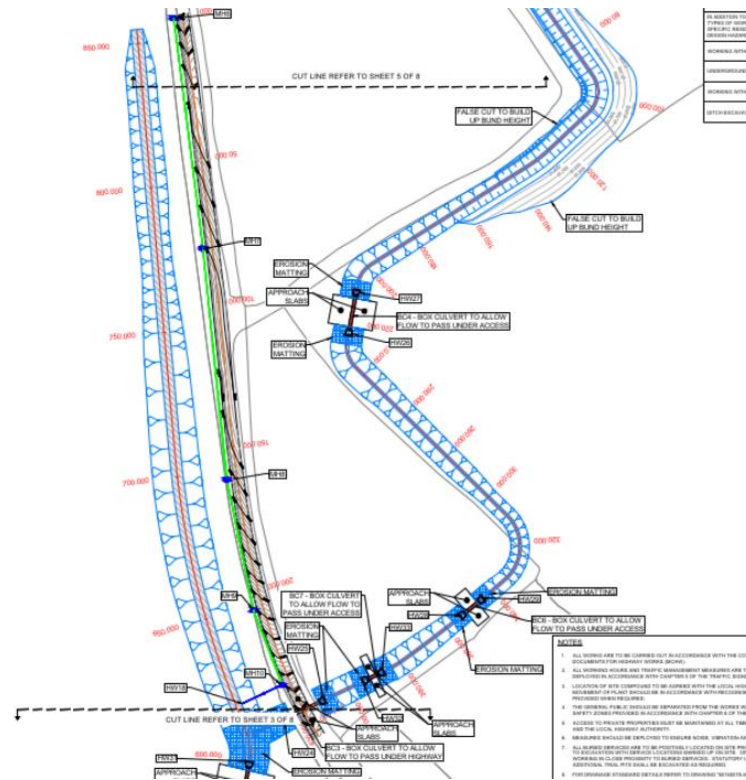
Extract from Detailed Design drawings Illustrating Proposed Drainage at Singingstone Lane
